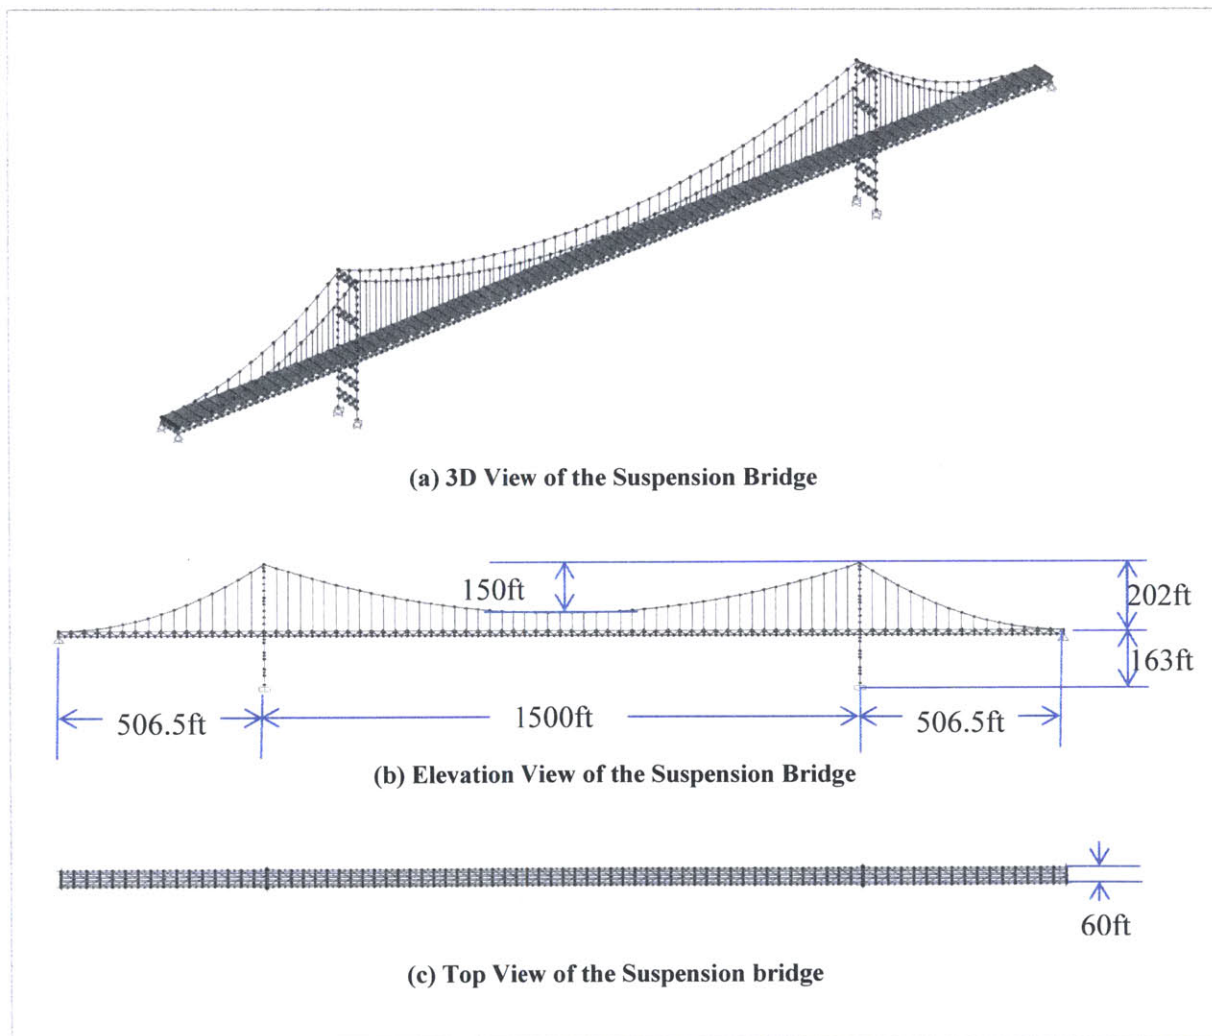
Suspension Bridge Model (a) 3D View; (b) Elevation View; (c) Top View
